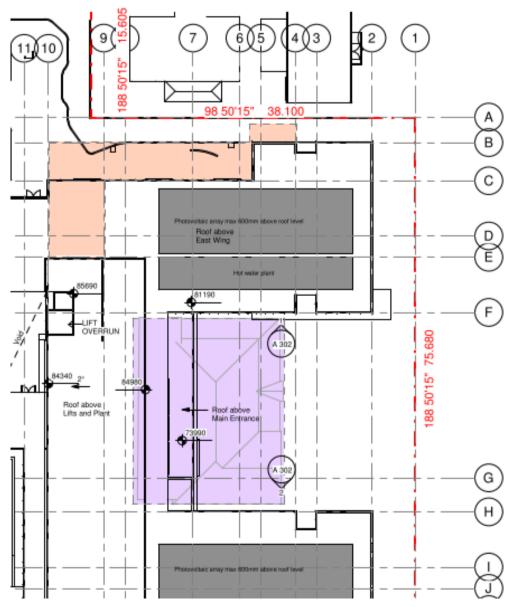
Roof level showing plant room extended to the north over R2 zone and patient rooms moved to 3m of boundary with No 59 Hotham Rd
